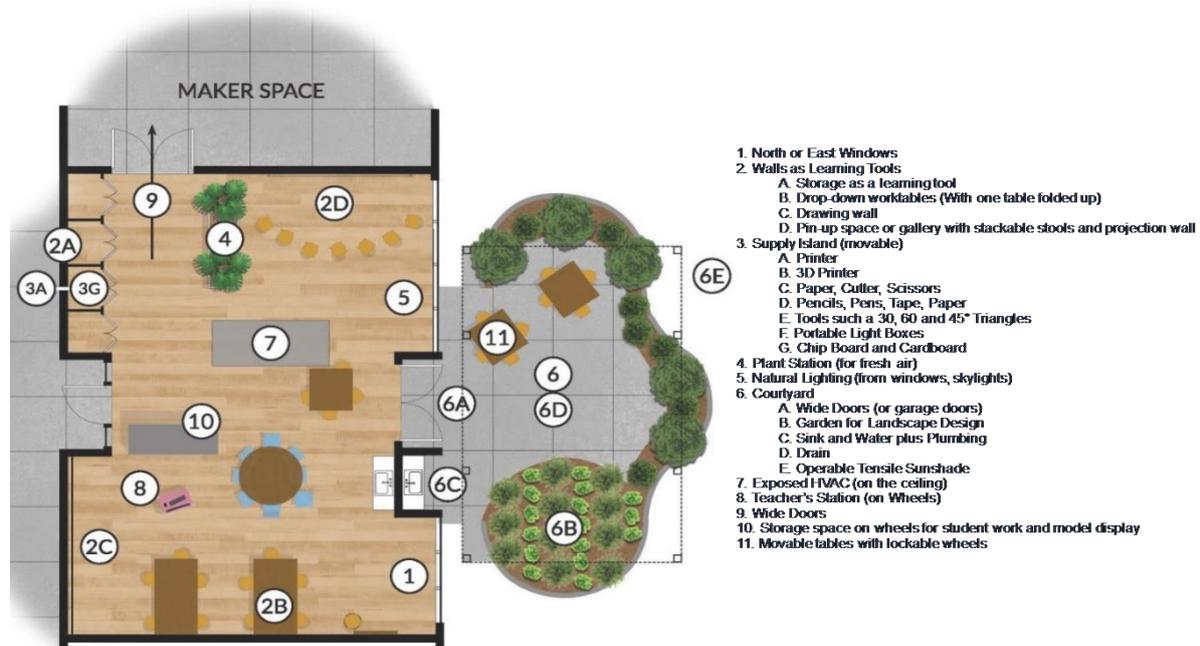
Remodelled Classroom as Studio for all students. Taylor collaborated with Arlo Braun, architect, and Camilla Kennedy, graphic artist, to design this plan view to suggest ease of flow between indoor and outdoor spaces for learning. (Source: Braun/Kennedy 2020)
